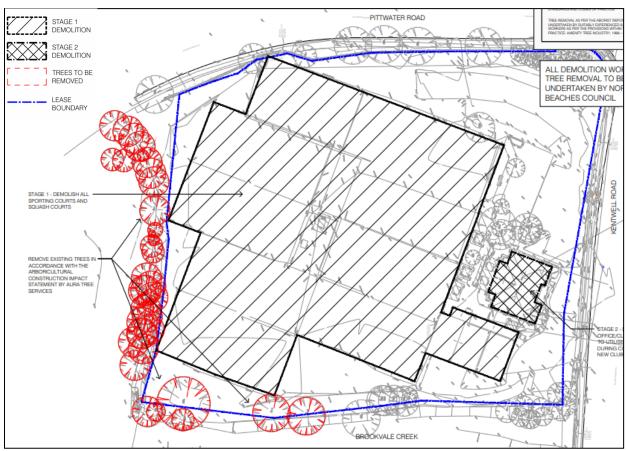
Proposed Demolition Plan (Source: Group Architects, 2022)
